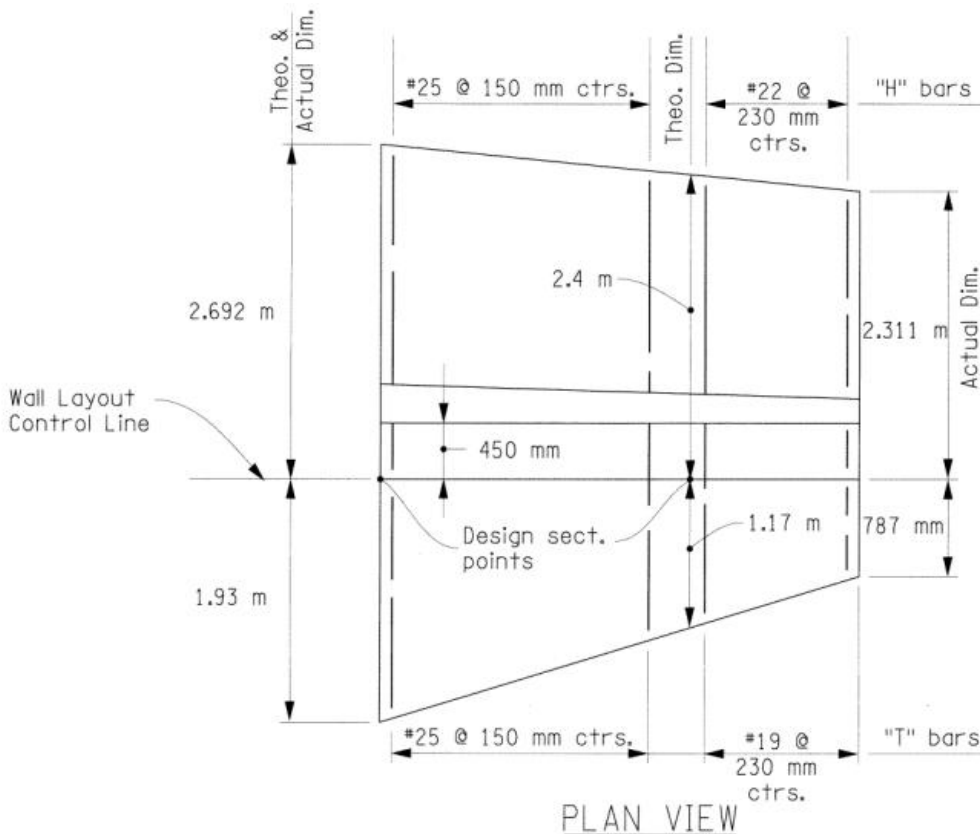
Illustrative Example (Slightly Sloping Wall - Plan View)
